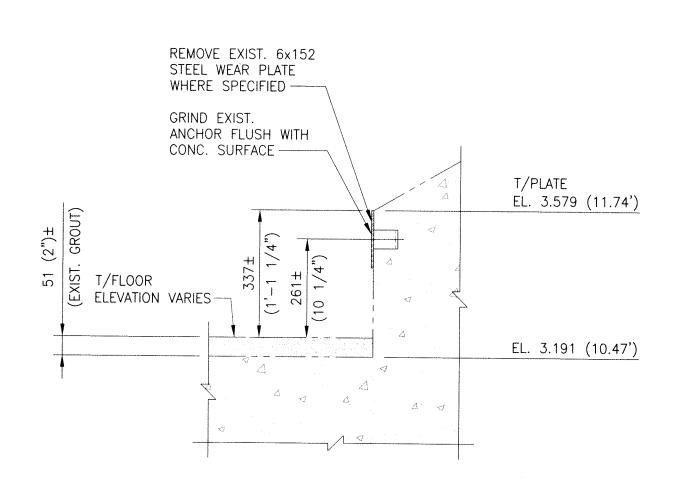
DETAIL - WEAR PLATE STRAIGHT PORTION OF WALL SCALE: 1:10
